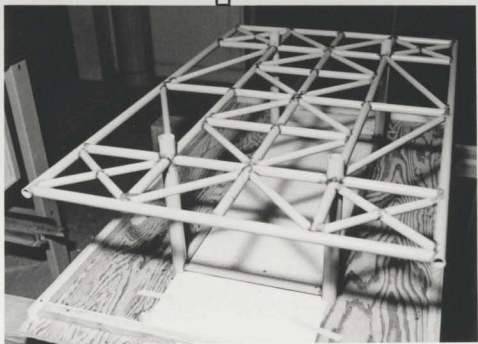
JACKET UNDER CONSTRUCTION (A→B).
